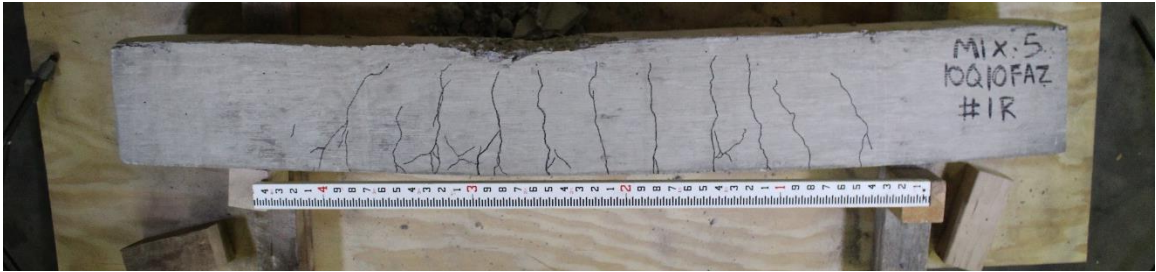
Mixture 5 (10Q10FA2) beam #1R: concrete beam side view.
